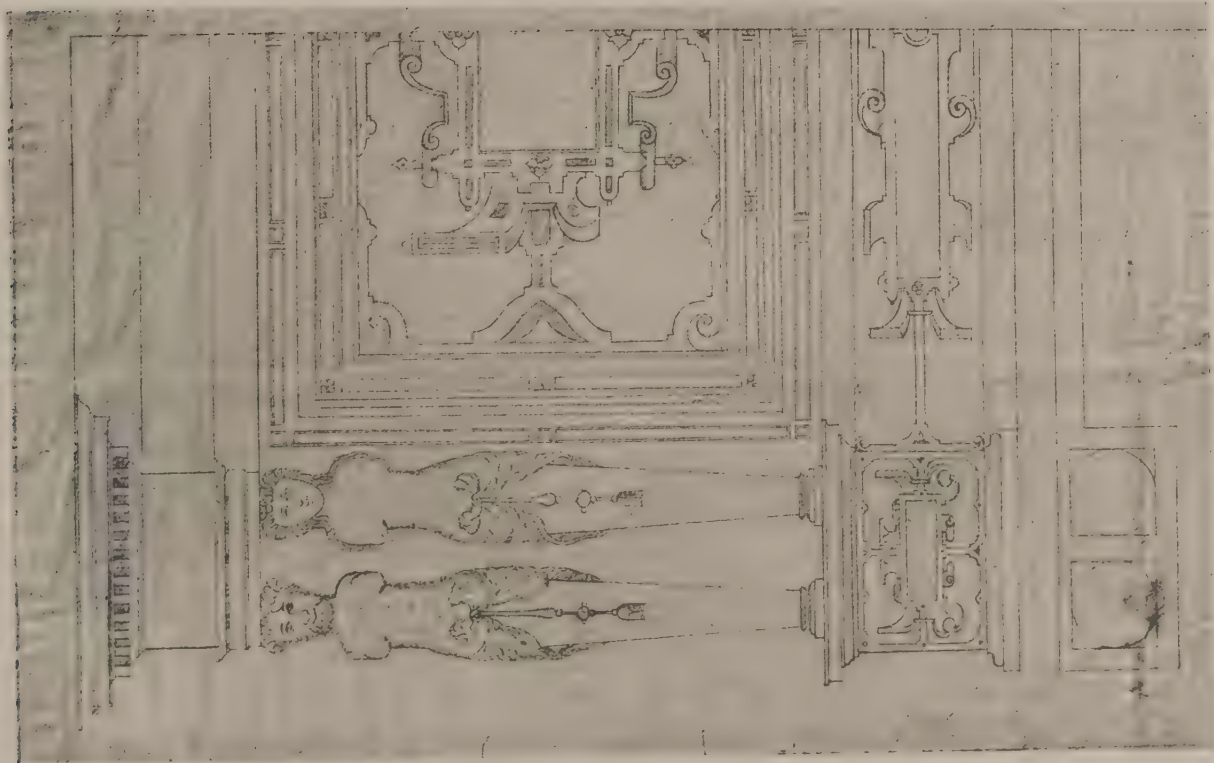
HALF ELEVATION OF A WALL-TOMB
